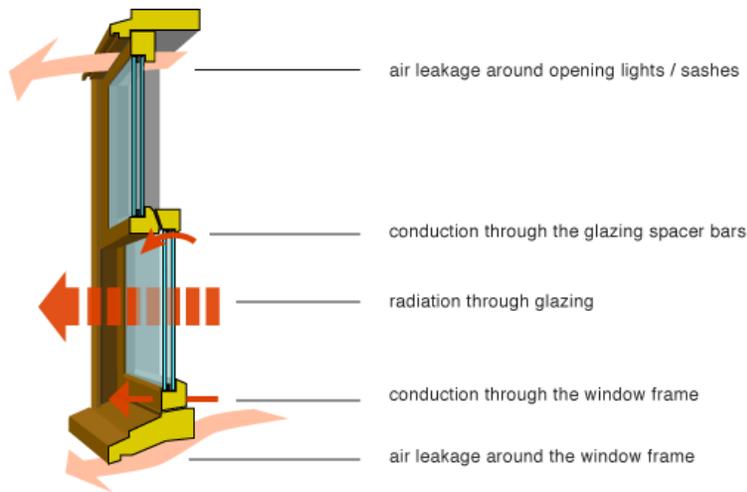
Heat losses through windows (Source: [www.greenspec.co.uk buildingdesign](http://www.greenspec.co.uk/buildingdesign/)).
